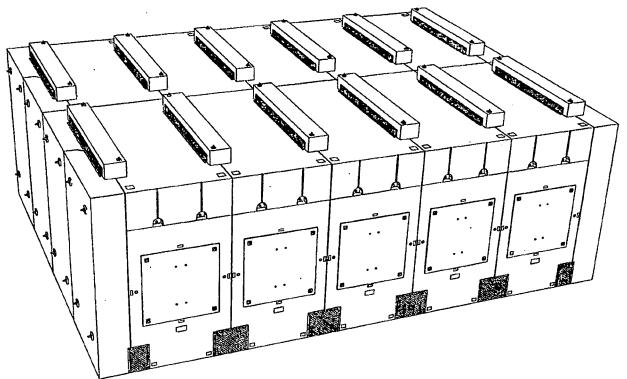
, General Arrangement of Proposed HSM-HB modules (2x5 shown, 2x12 planned)
